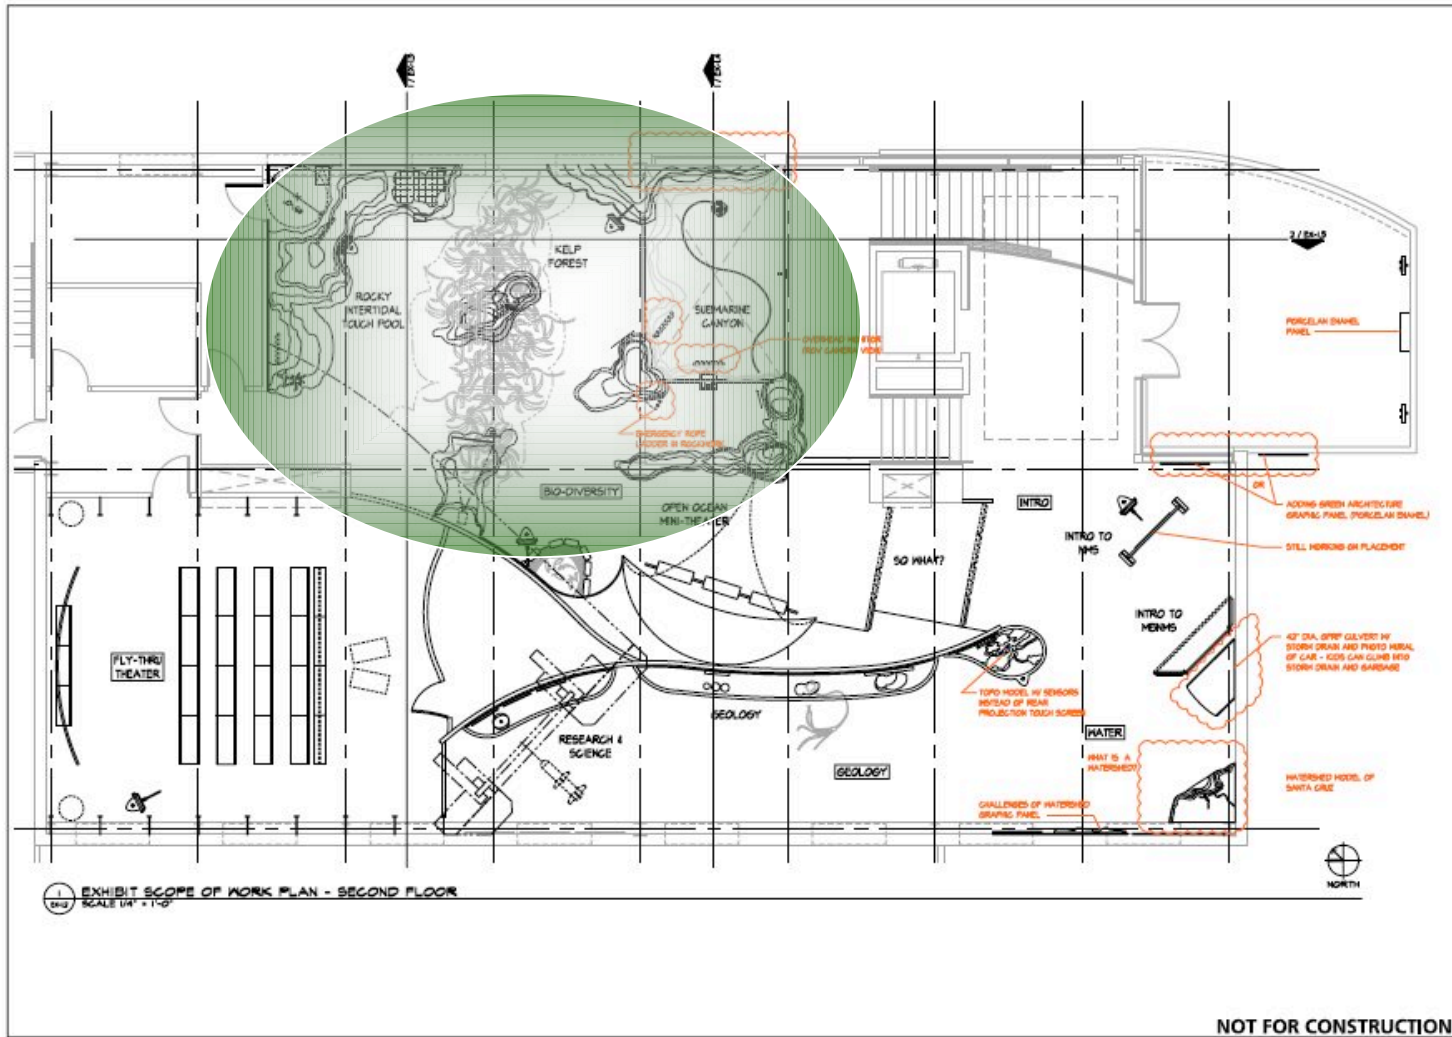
EXHIBIT SCOPE OF WORK PLAN - SECOND FLOOR
